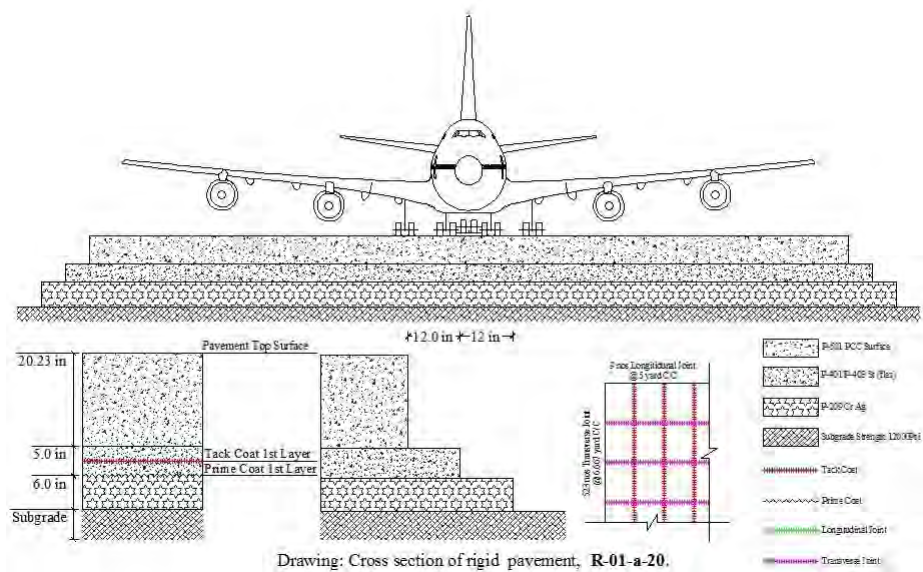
Rigid Pavement (R-01-a-20) cross sectional drawing.
